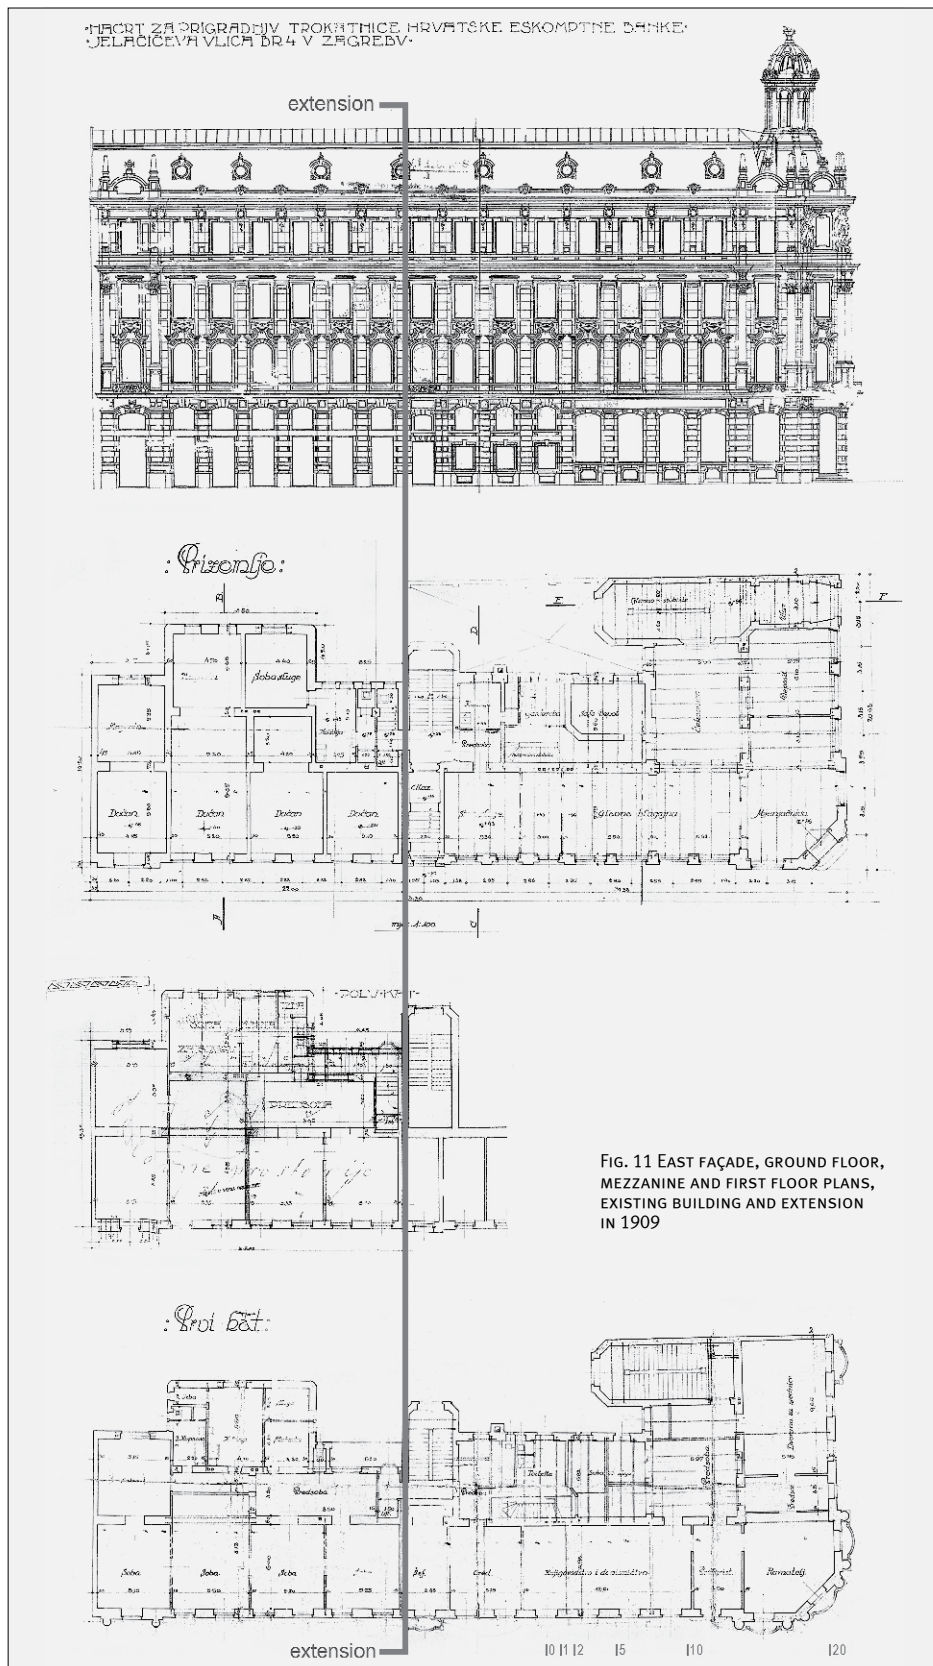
EAST FAÇADE, GROUND FLOOR, MEZZANINE AND FIRST FLOOR PLANS, EXISTING BUILDING AND EXTENSION IN 1909
